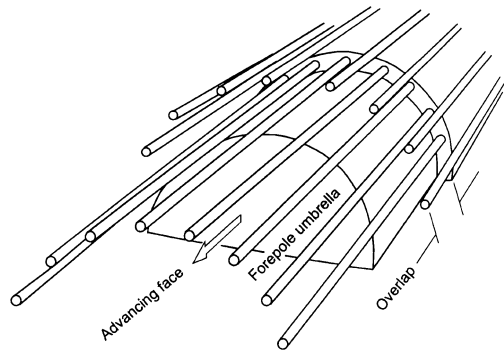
Sketch of tunnelling under the protection of a forepole umbrella.
